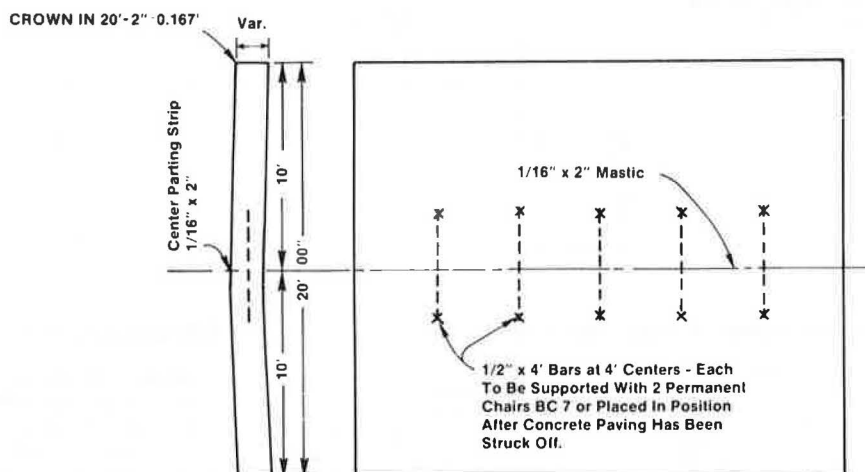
Layout for 4.5-in mesh-reinforced pavement.
